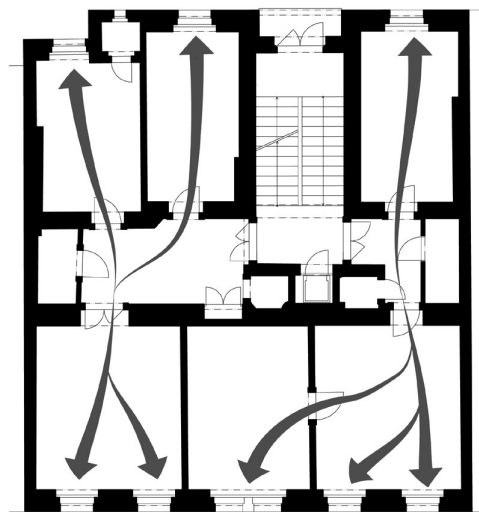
Cross ventilation in the 19th century tenement house (Source: autor)
